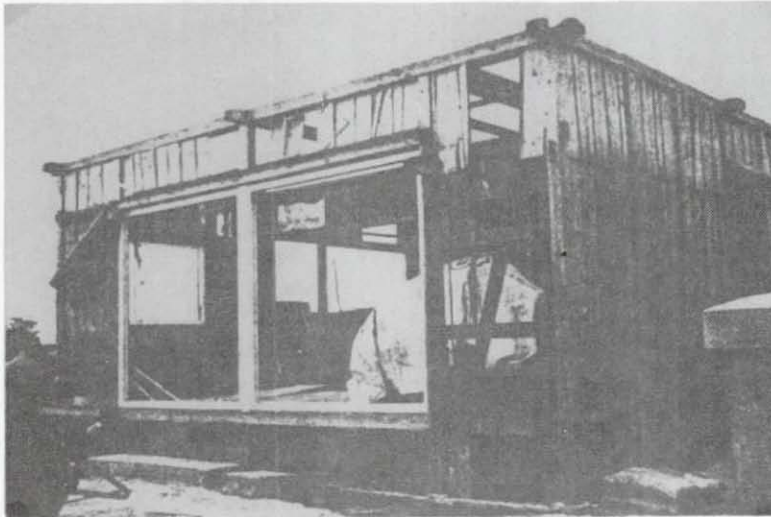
DWELLING WHOSE ROOF WAS BLOWN AWAY LEAVING GIRDERS
